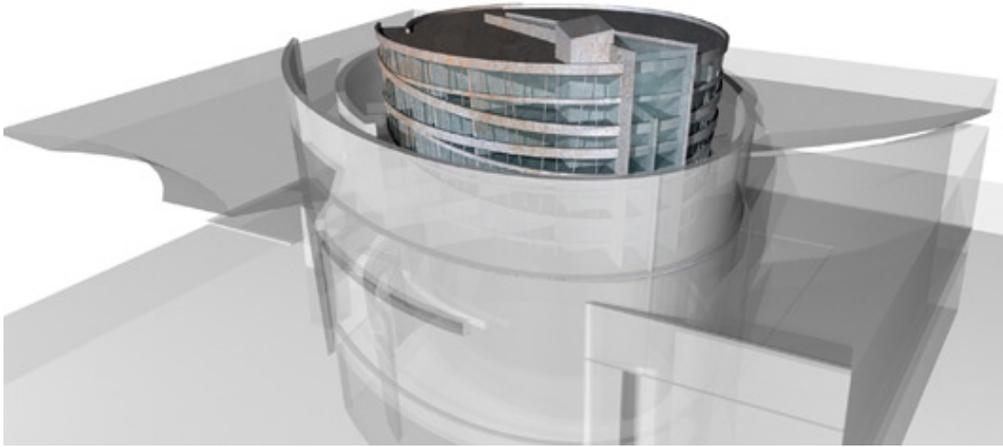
Rendering showing the Cradle apartments emerging from the roof
